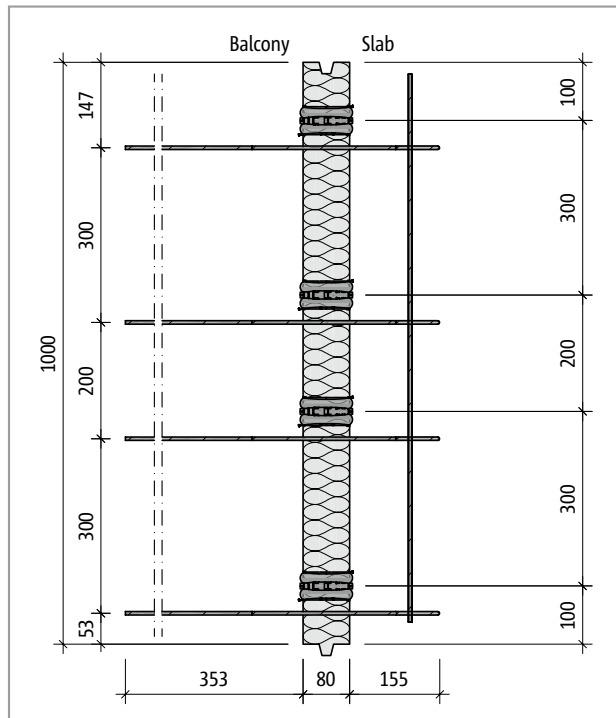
Schöck Isokorb® T type Q-V1: Product layout
